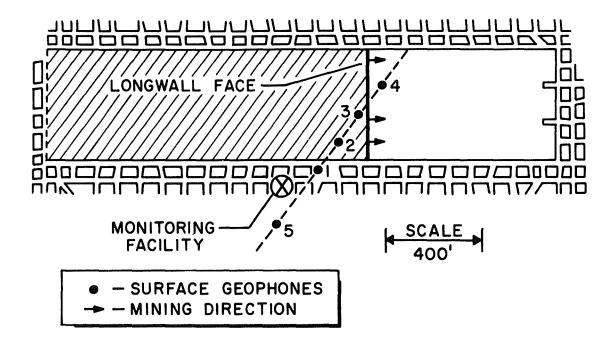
Details of A-2 Longwall Site Showing Position of Longwall Face and Geophone Locations
